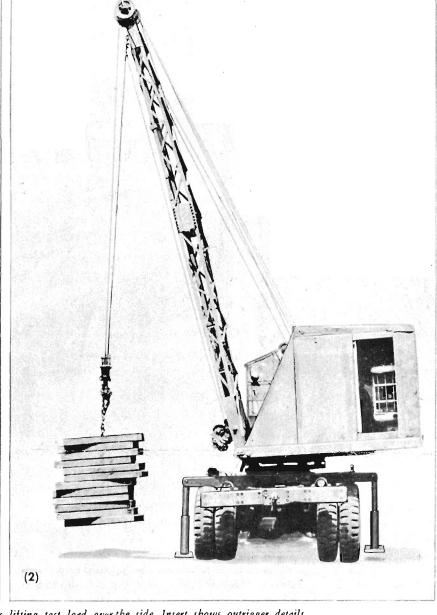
Truck-mounted 3/8-cubic yard crane with outriggers lifting test load over the side. Insert shows outrigger details.
